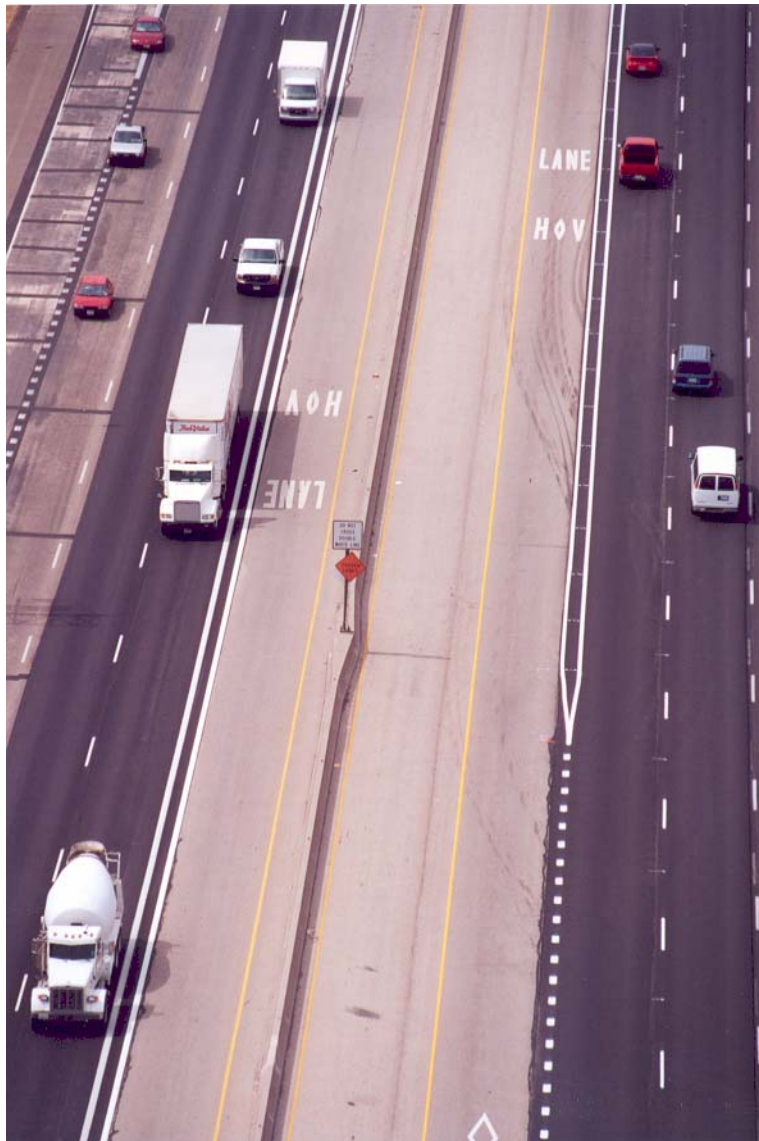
Word and Diamond Pavement Markings on I-35E (Stemmons Freeway) in Dallas, Texas.
